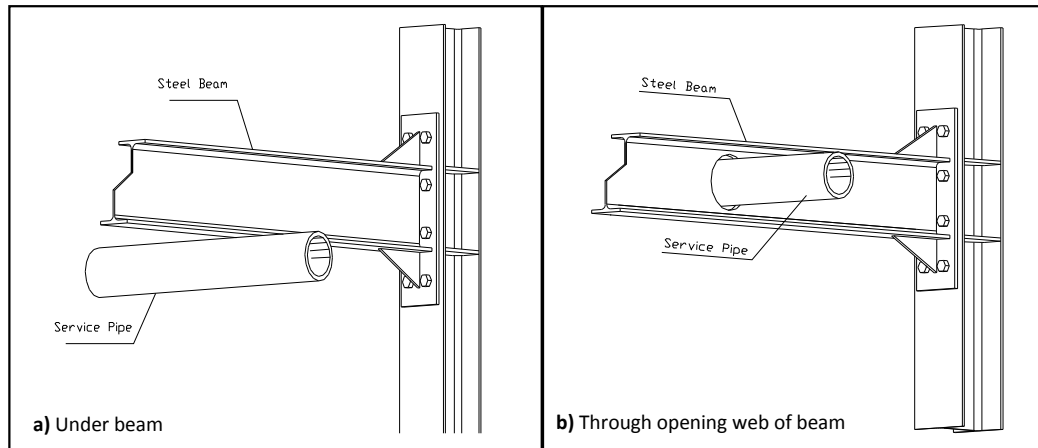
Passing service pipe; a) Under beam b) Through opening web of beam
